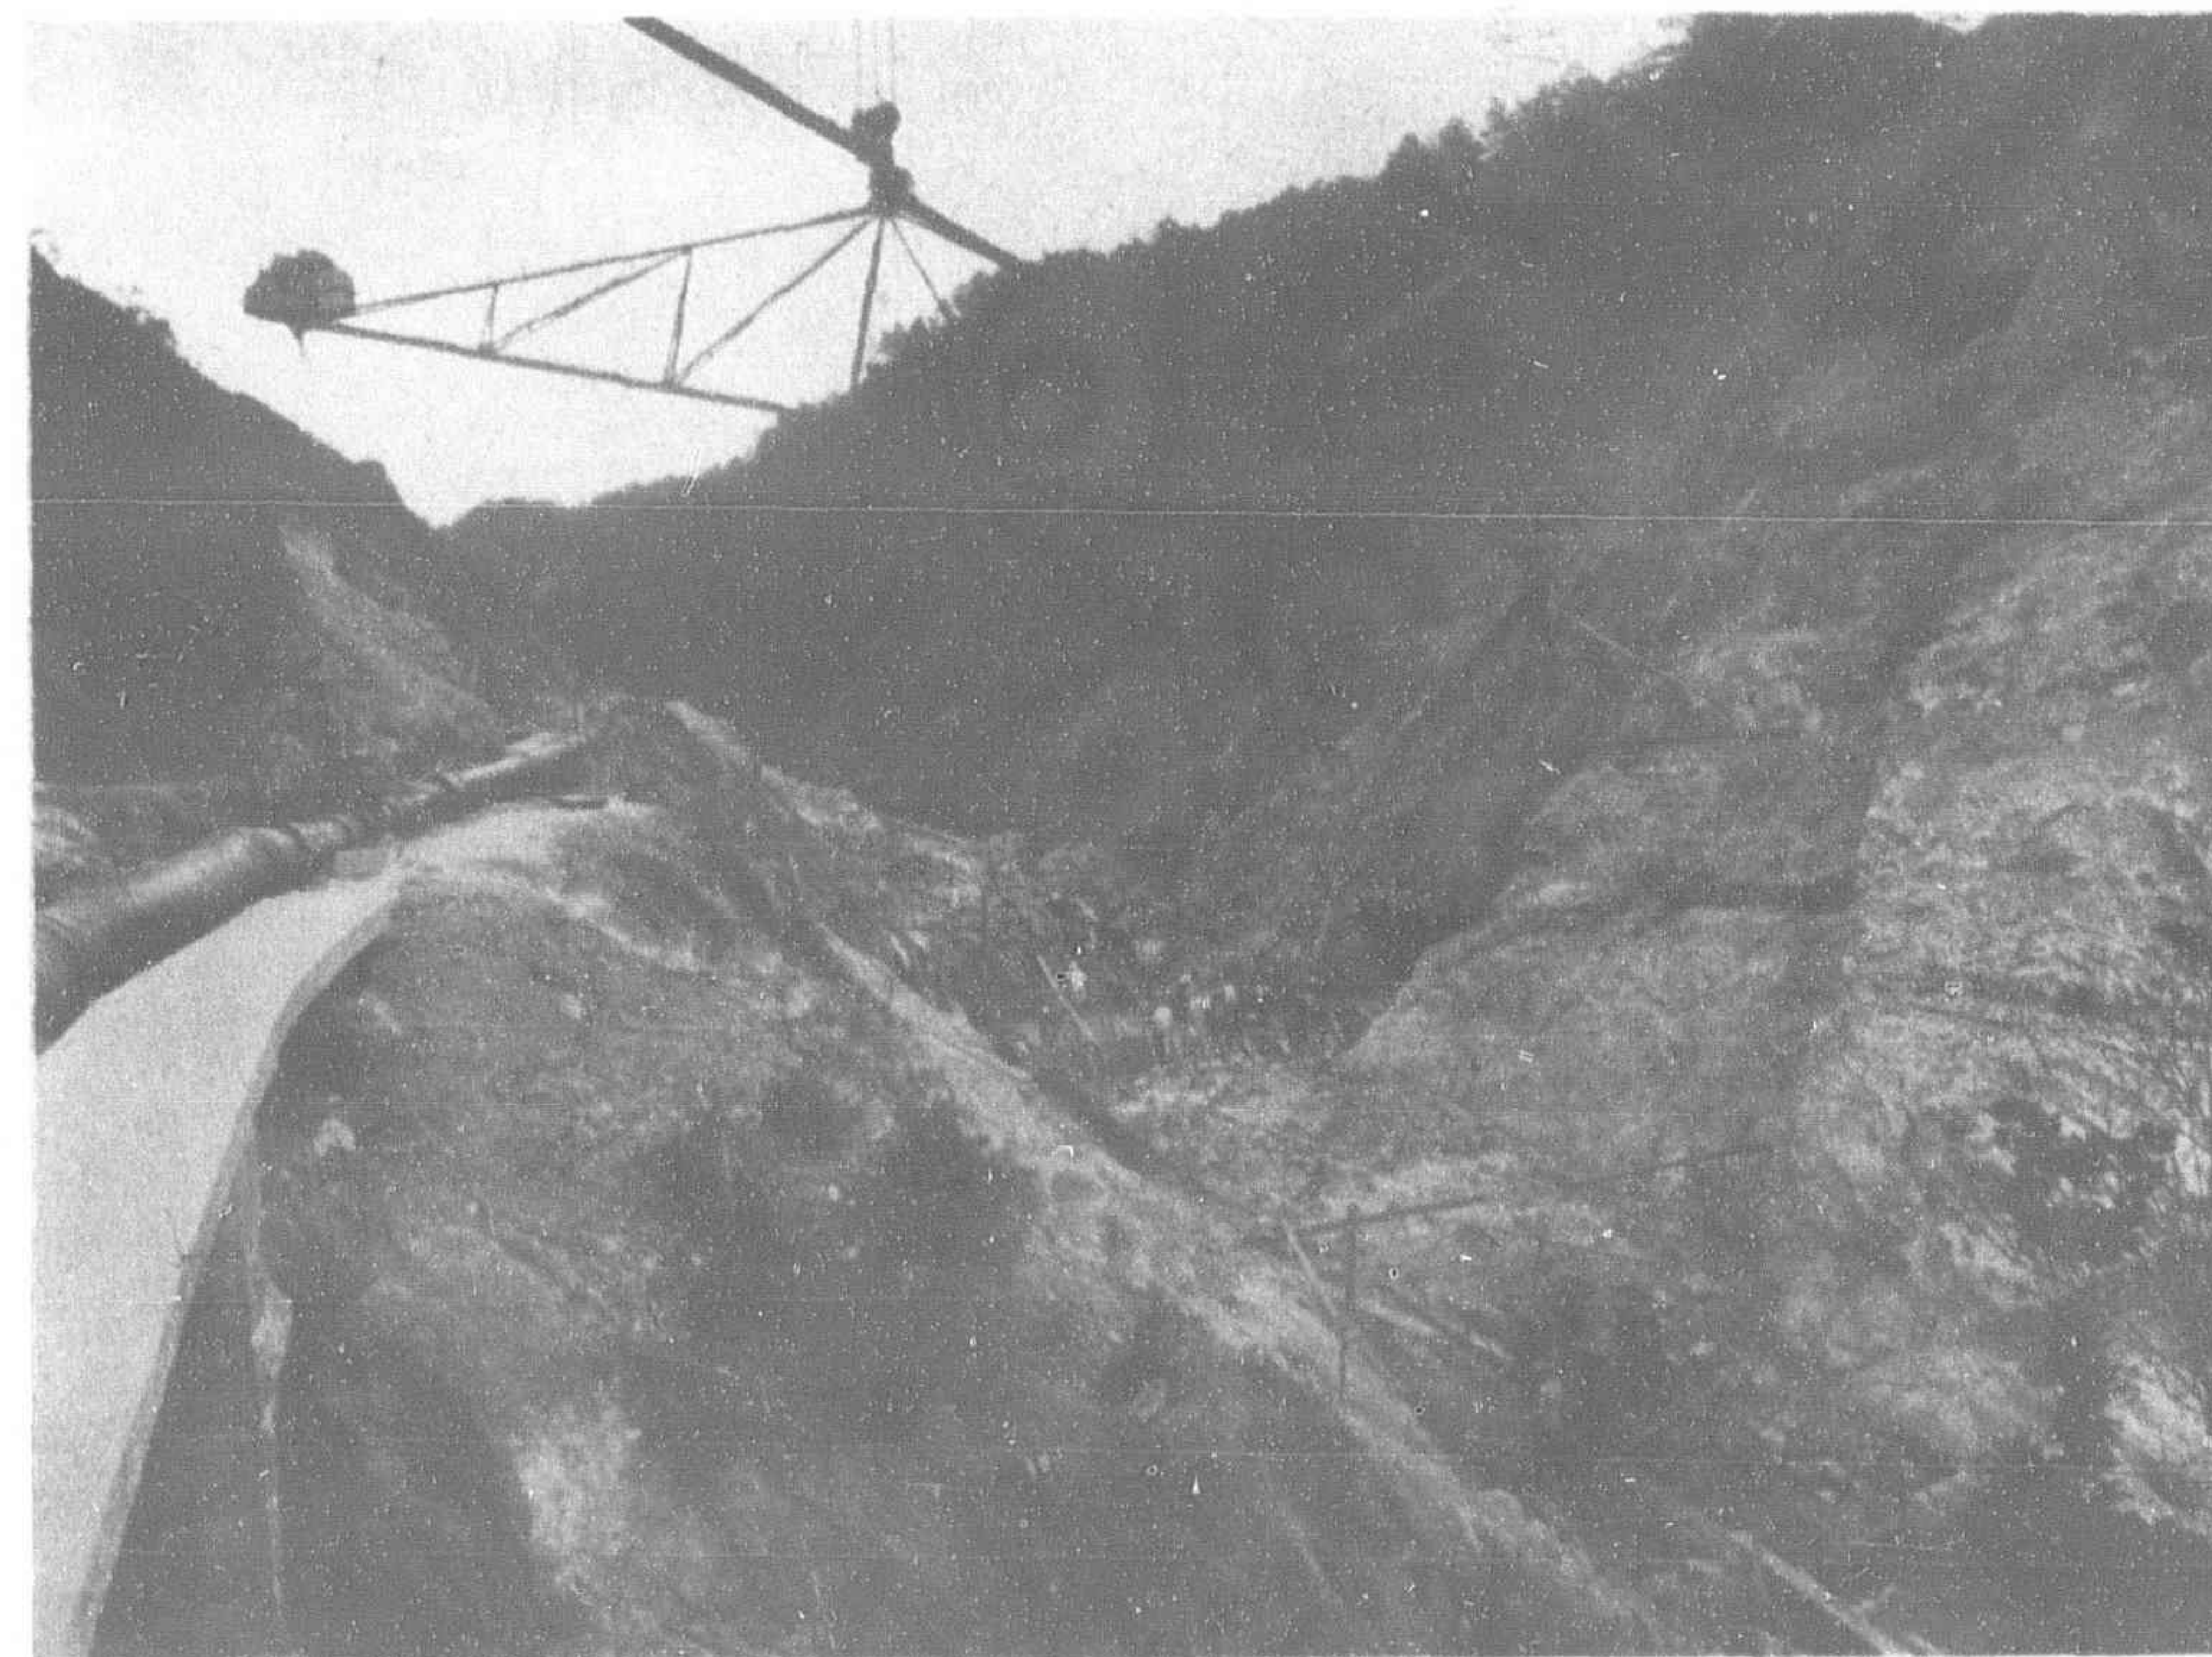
Initial stages of construction of Kowloon Byewash Dam
